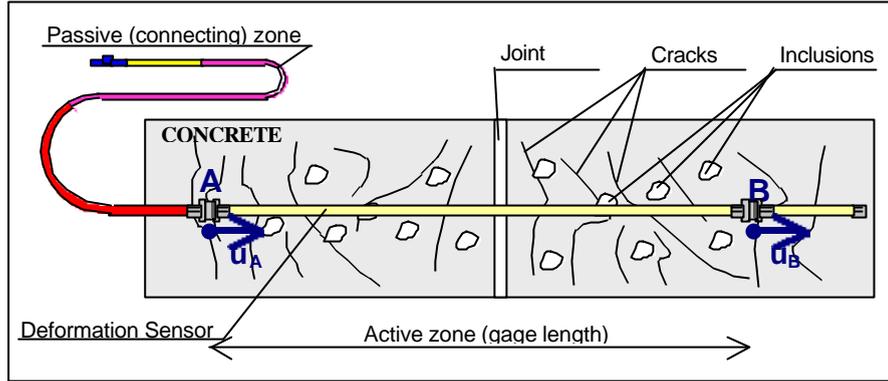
Schema of a long-gage sensor installed on a concrete beam with cracks, inclusions and joints
